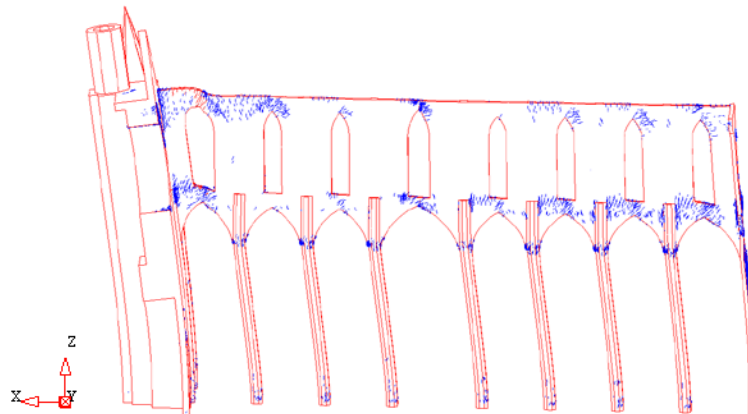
Crack patterns (in blue) after an earthquake in +X direction at frame of pillars and upper clerestory wall
